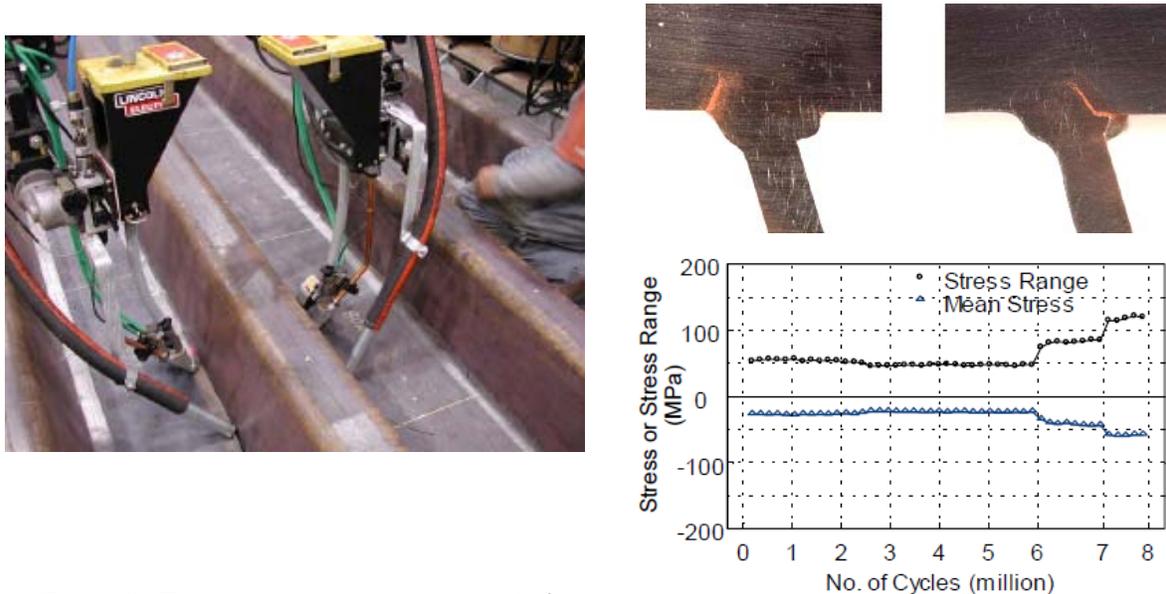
Typical welding process used to fabricate orthotropic steel bridge deck (left) and example fatigue test specimens and data for evaluation of partial-joint-penetration welds (right).
